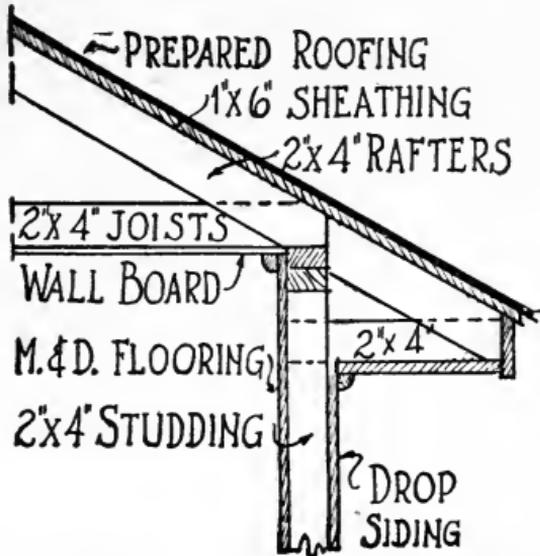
Detail Showing Cornice Construction of the Small Dairy House
